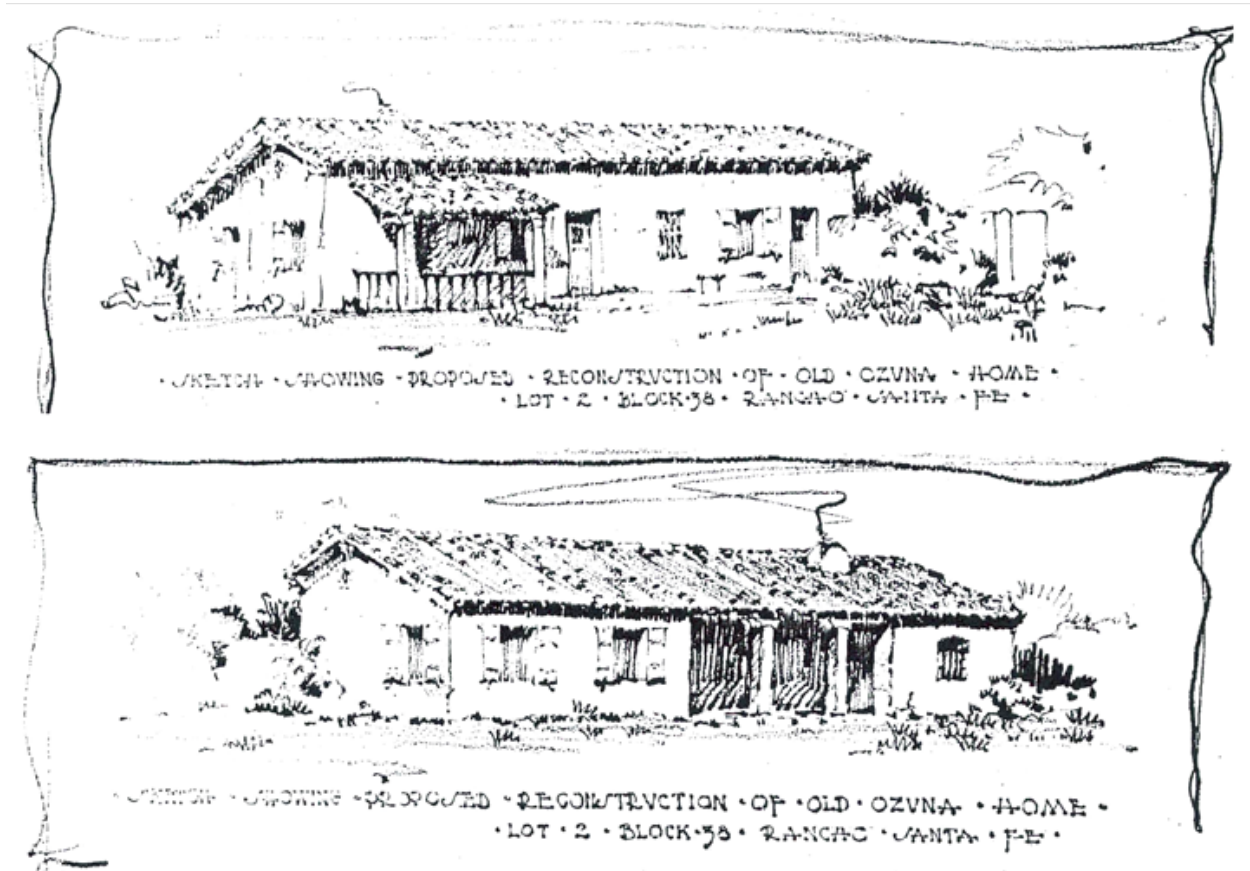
South elevation showing the original porch that extended along the entire south elevation with a raised wood porch deck. Source: Southwest Museum.
